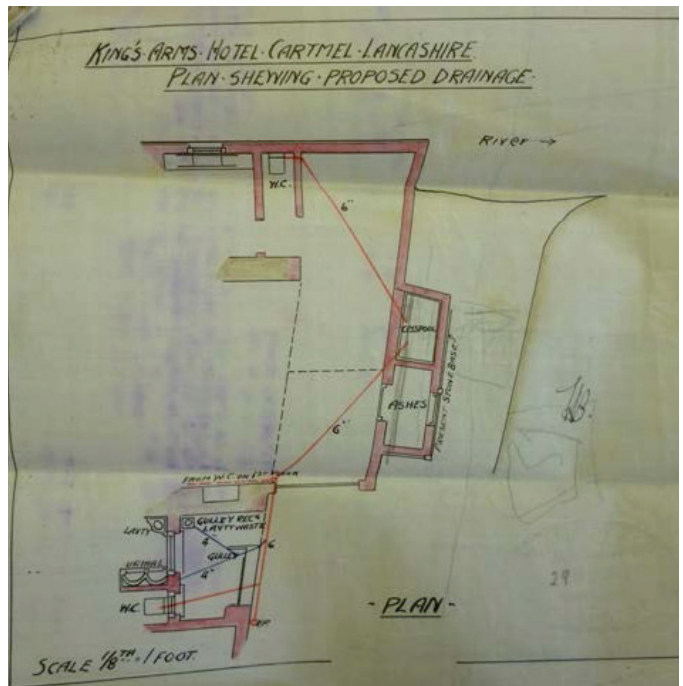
(right): Proposed drainage improvement (CAC(B) BSRDNL/2/583 1909)
